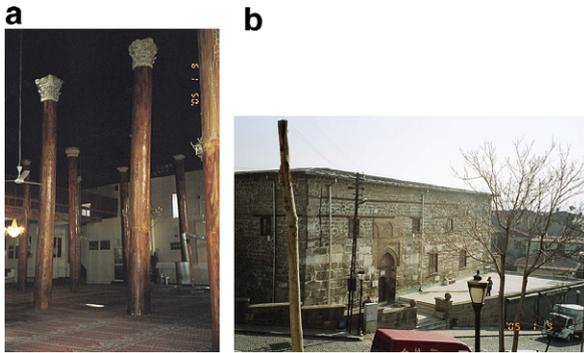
The roof and timber ceiling structure of Aslanhane Mosque were supported with 24 timber pillars (a) and stone masonry walls with timber lintels and bond beams (b).
